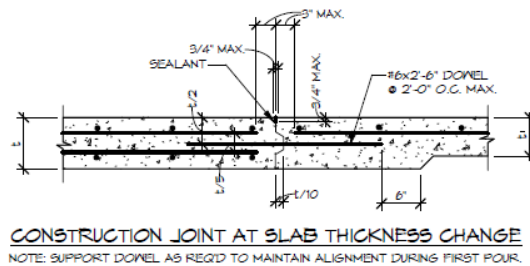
Typical joint when the slab alters its size at the exterior of the building
